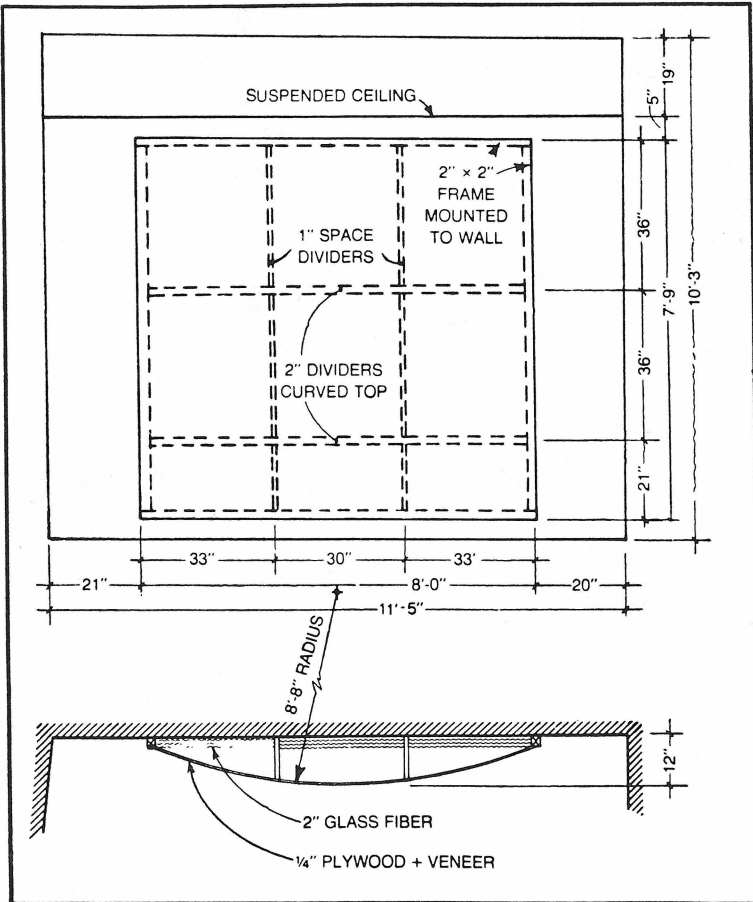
Constructional details of a large semicylindrical diffuser/absorber mounted on the south wall of the studio.
